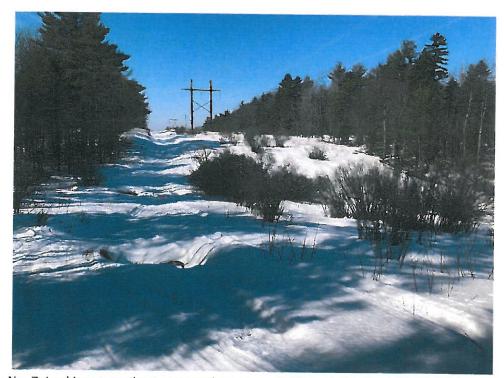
Looking easterly at proposed access route through Wetland IW-24 towards Structure 296. Timber matting will be used through the wetland portion of the access road.
